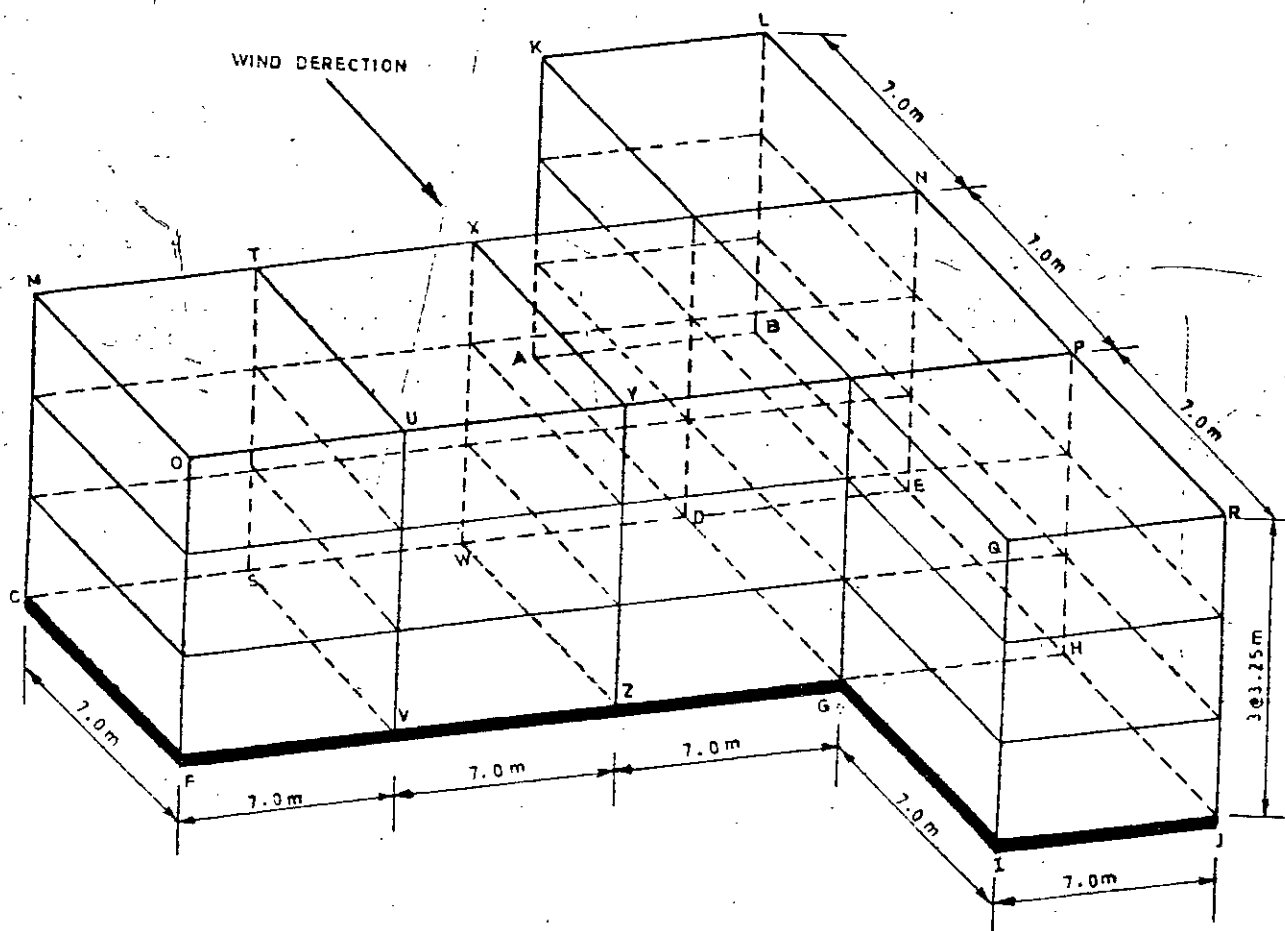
THE FINITE ELEMENT MESH OF 3-STOREY SPACE STRUCTURE AND MAT FOUNDATION.
